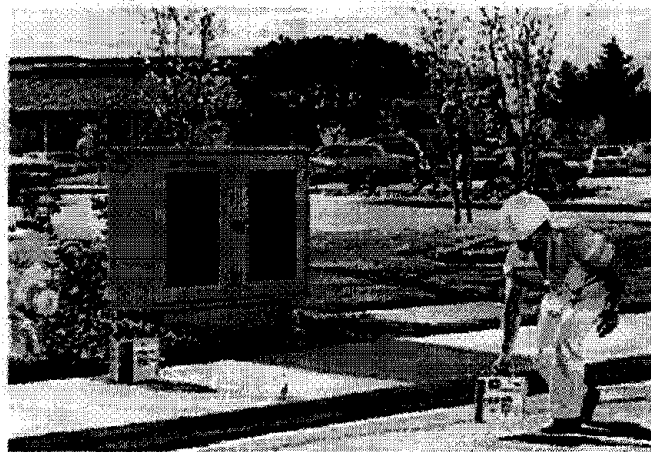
Utility-locating instrument in use. (Metrotech, Inc.)
